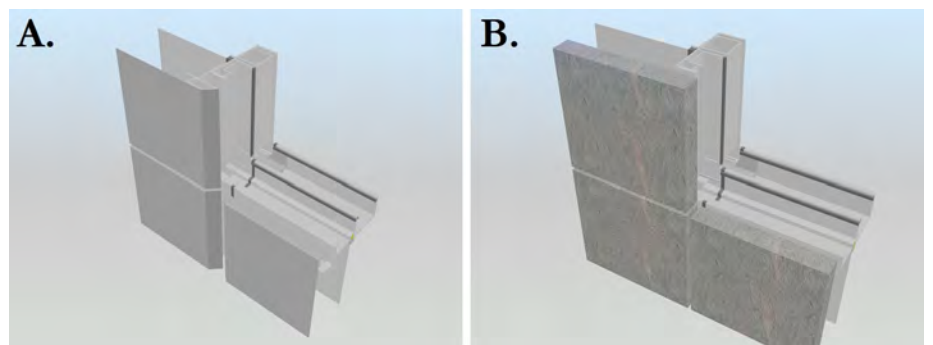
A. Wall Type 8 - Stainless Steel cladding, B. Wall Type 9 - Stone cladding
